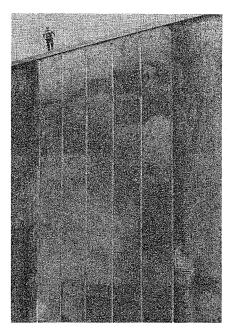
Steel profiles embedded in shotcrete, Cignana Dam
